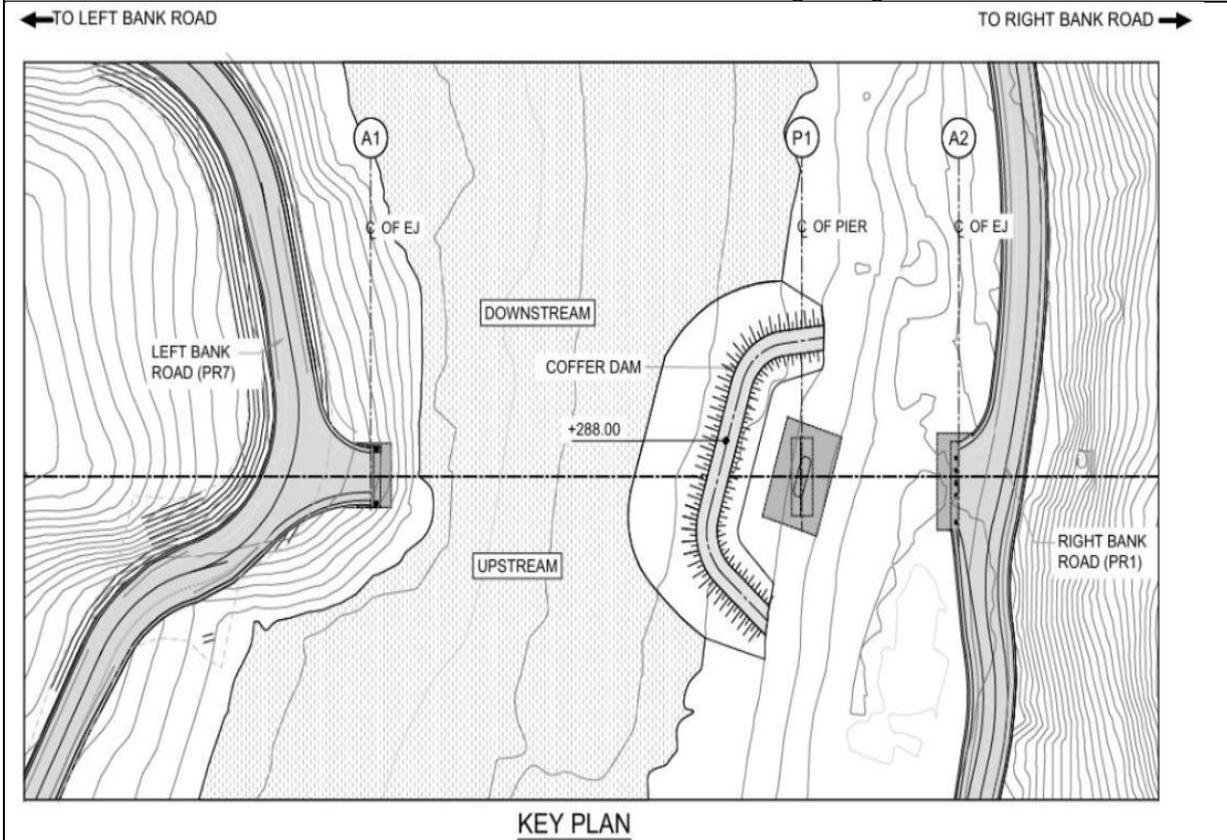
Schematic Sketch of Dibang Bridge Pier with Cofferdam
